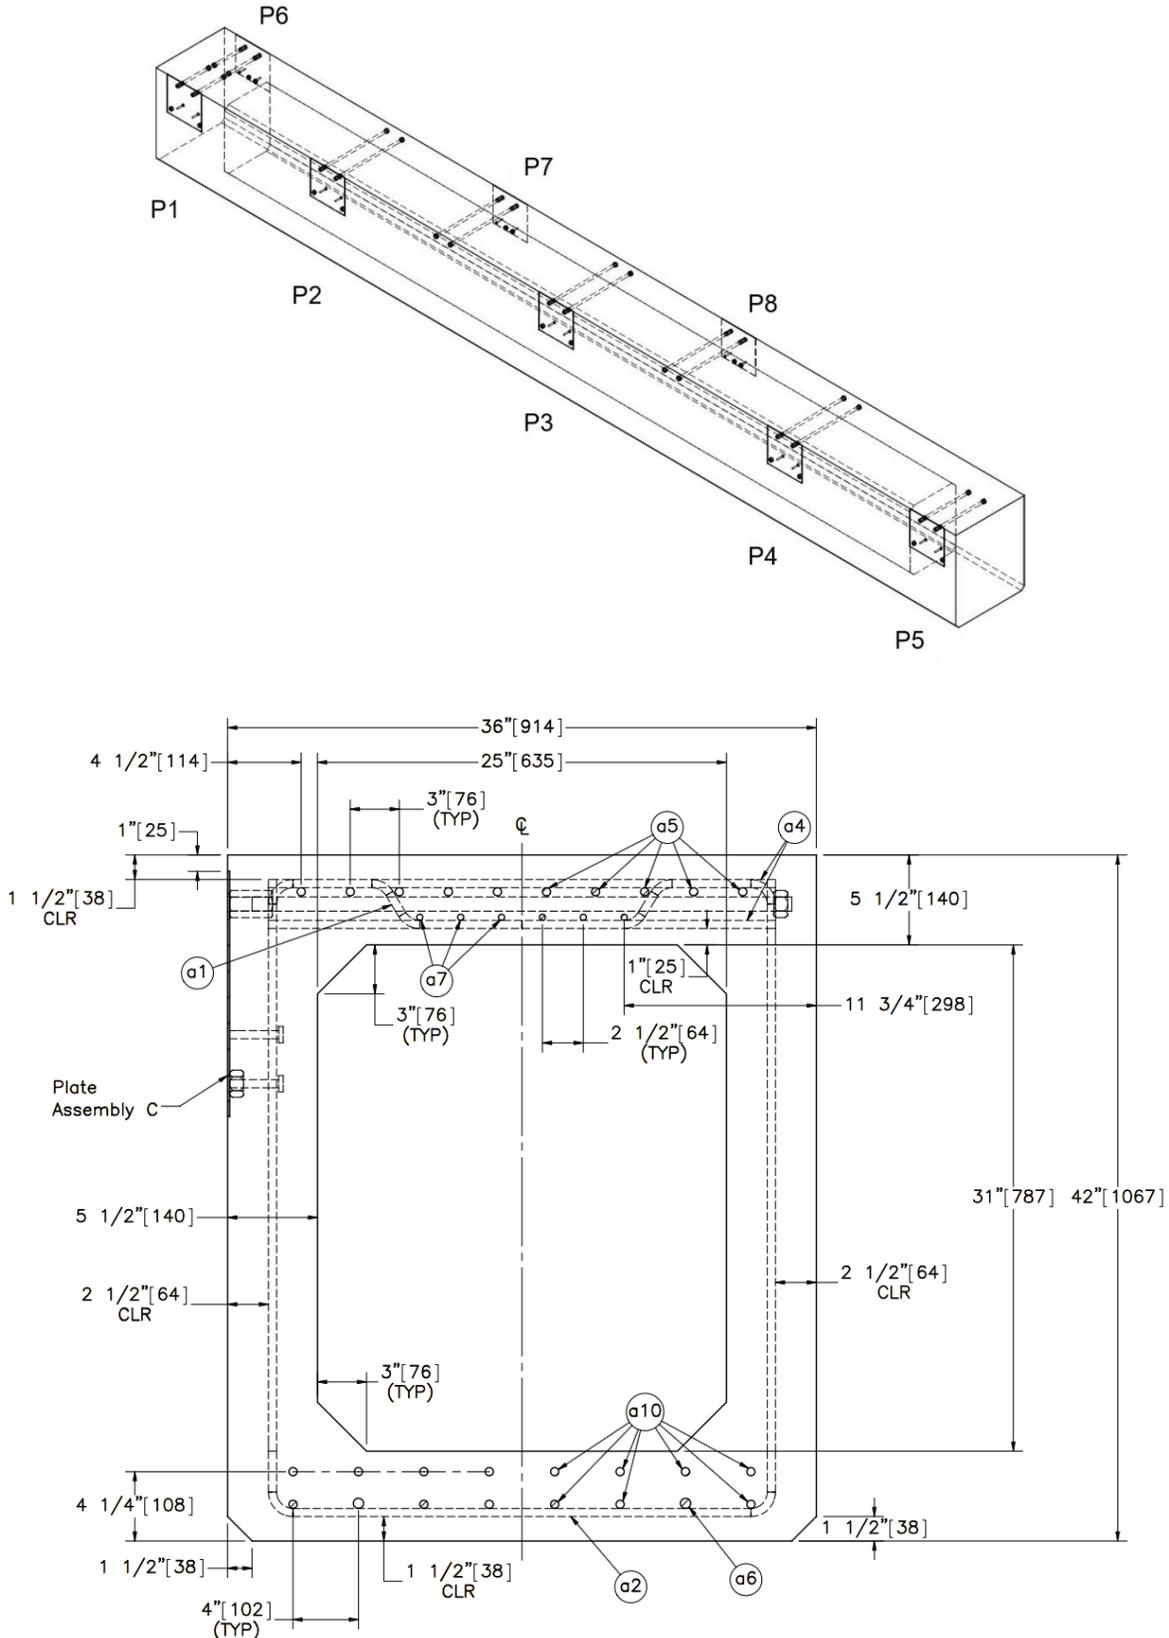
Illinois-Ohio (IL-OH) Box-Beam Girder Selected for Component Testing
